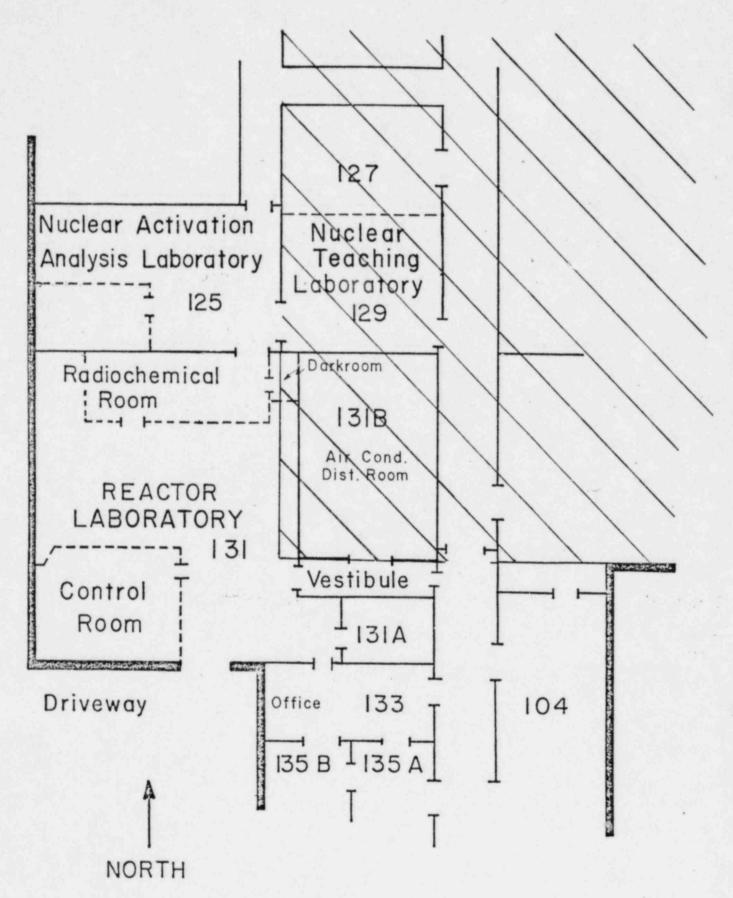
TAYLOR HALL FLOOR PLAN ADJACENT ROOMS TO 131
